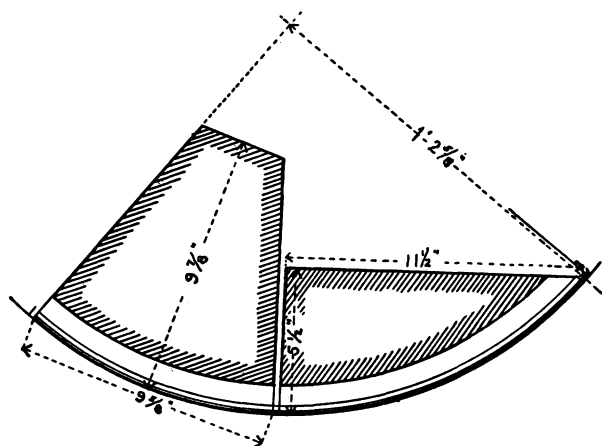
SHAPE AND ARRANGEMENT OF FILLET BRICKS IN CAPITAL.
